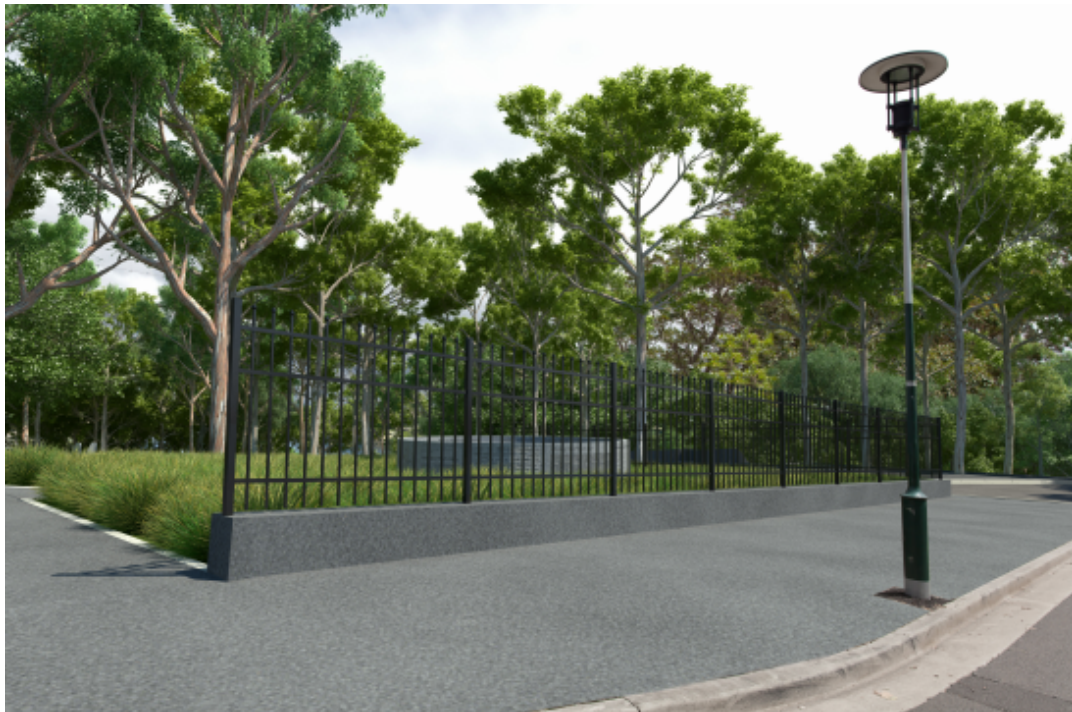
Argyle Street toward Dalgety Road intersection, proposed view
